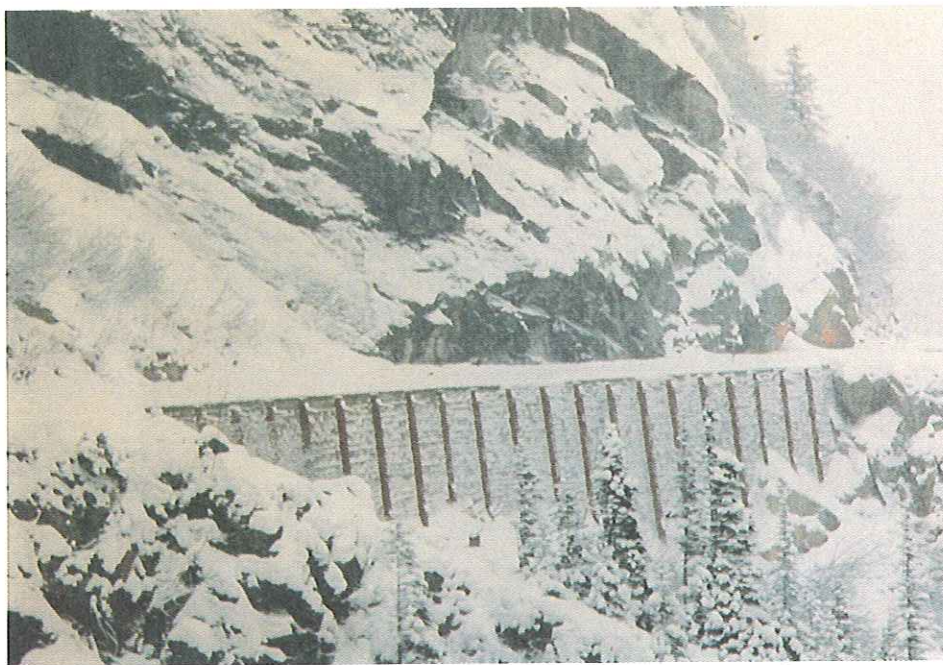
Concrete wall stabilized with tensioned anchored bolts and channel sections. This construction was used to widen the travelled section and reduce the rock excavation at the toe of a high steep bedded slope that should not be undercut.
